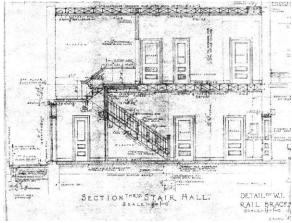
, Fredericksburg Courthouse, Detail, North wing, section through stair inserted in 1948. J. Binford Walford & O. Pendleton Wright, Renovation drawings, 1948. Courtesy City of Fredericksburg.
